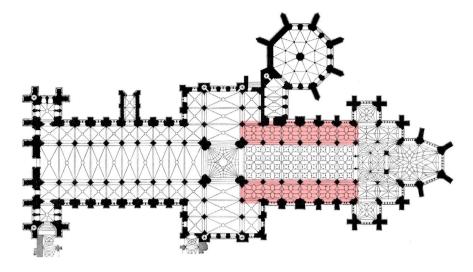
Georg Dehio plan of Wells Cathedral modified to highlight the north and south choir aisles.
